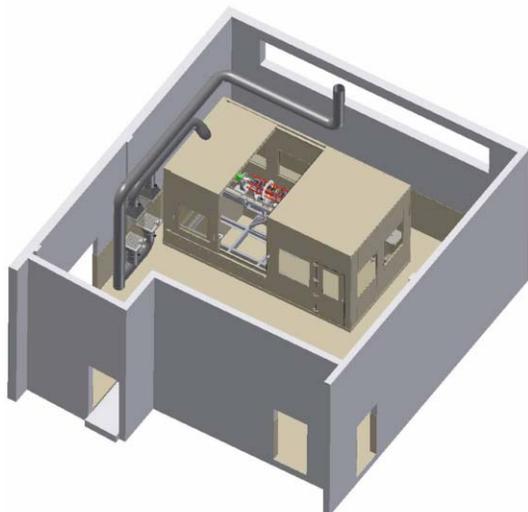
Layout of EP plant at ACCEL, EP plant is integrated into an existing building and installed inside a housing. The complete building is air conditioned and pressure controlled.
